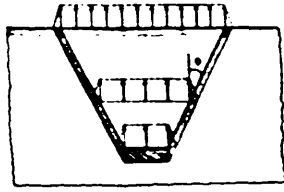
Proposed failure mechanism for shallow rectangular anchors, Vermeer & Sutjiadi 1985.
